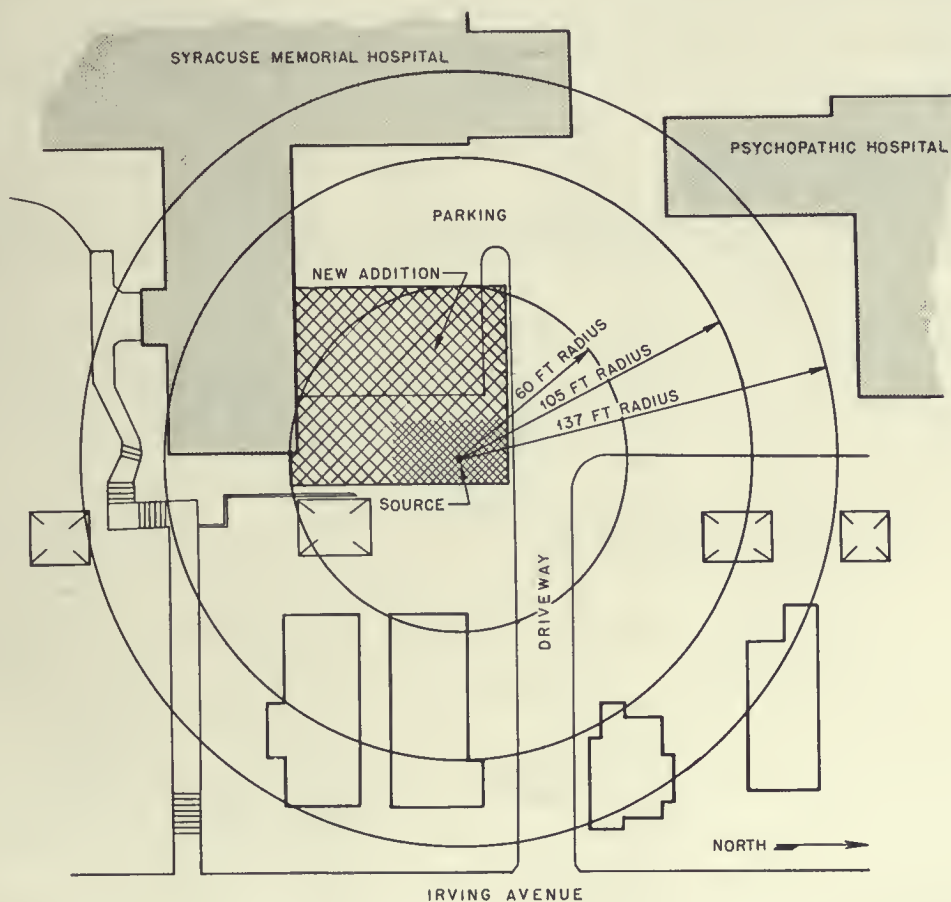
Site plan of proposed addition to the Syracuse Memorial Hospital.
